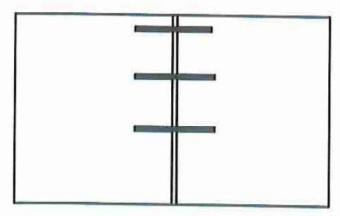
(a): Plan of Two Adjoining Slabs (UTWT/TWT) at Butt Type Longitudinal Joint
